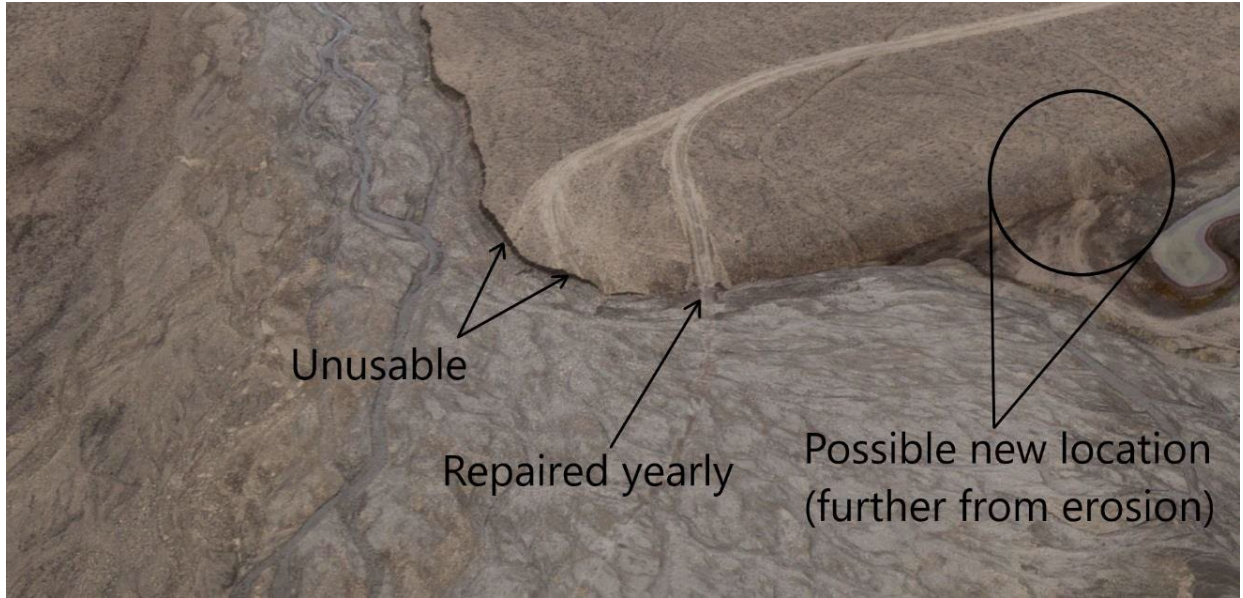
Erosion of access road from delta to GIC and proposed new location.
